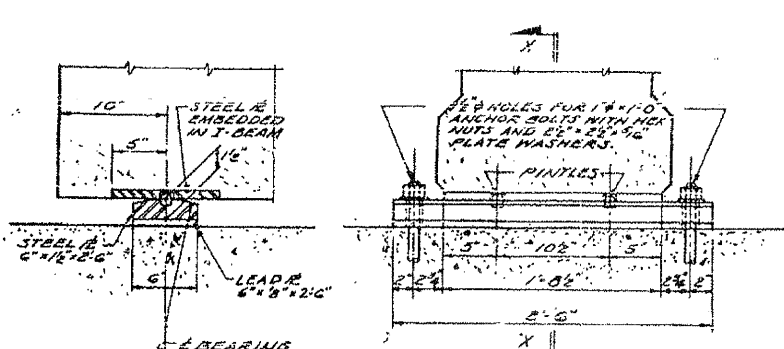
DETAILS OF PRECAST PRESTRESSED CONCRETE I-BEAMS GRADE SEPARATION CROSS ROAD OVER F.A.T. ROUTE 80
